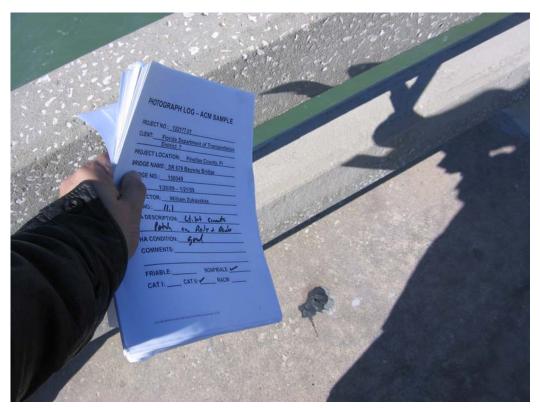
01/21/09 – SAMPLE 11.1 – HA 11 LIGHTWEIGHT CONCRETE PATCHING ON RAILS AND BRIDGE DECK
